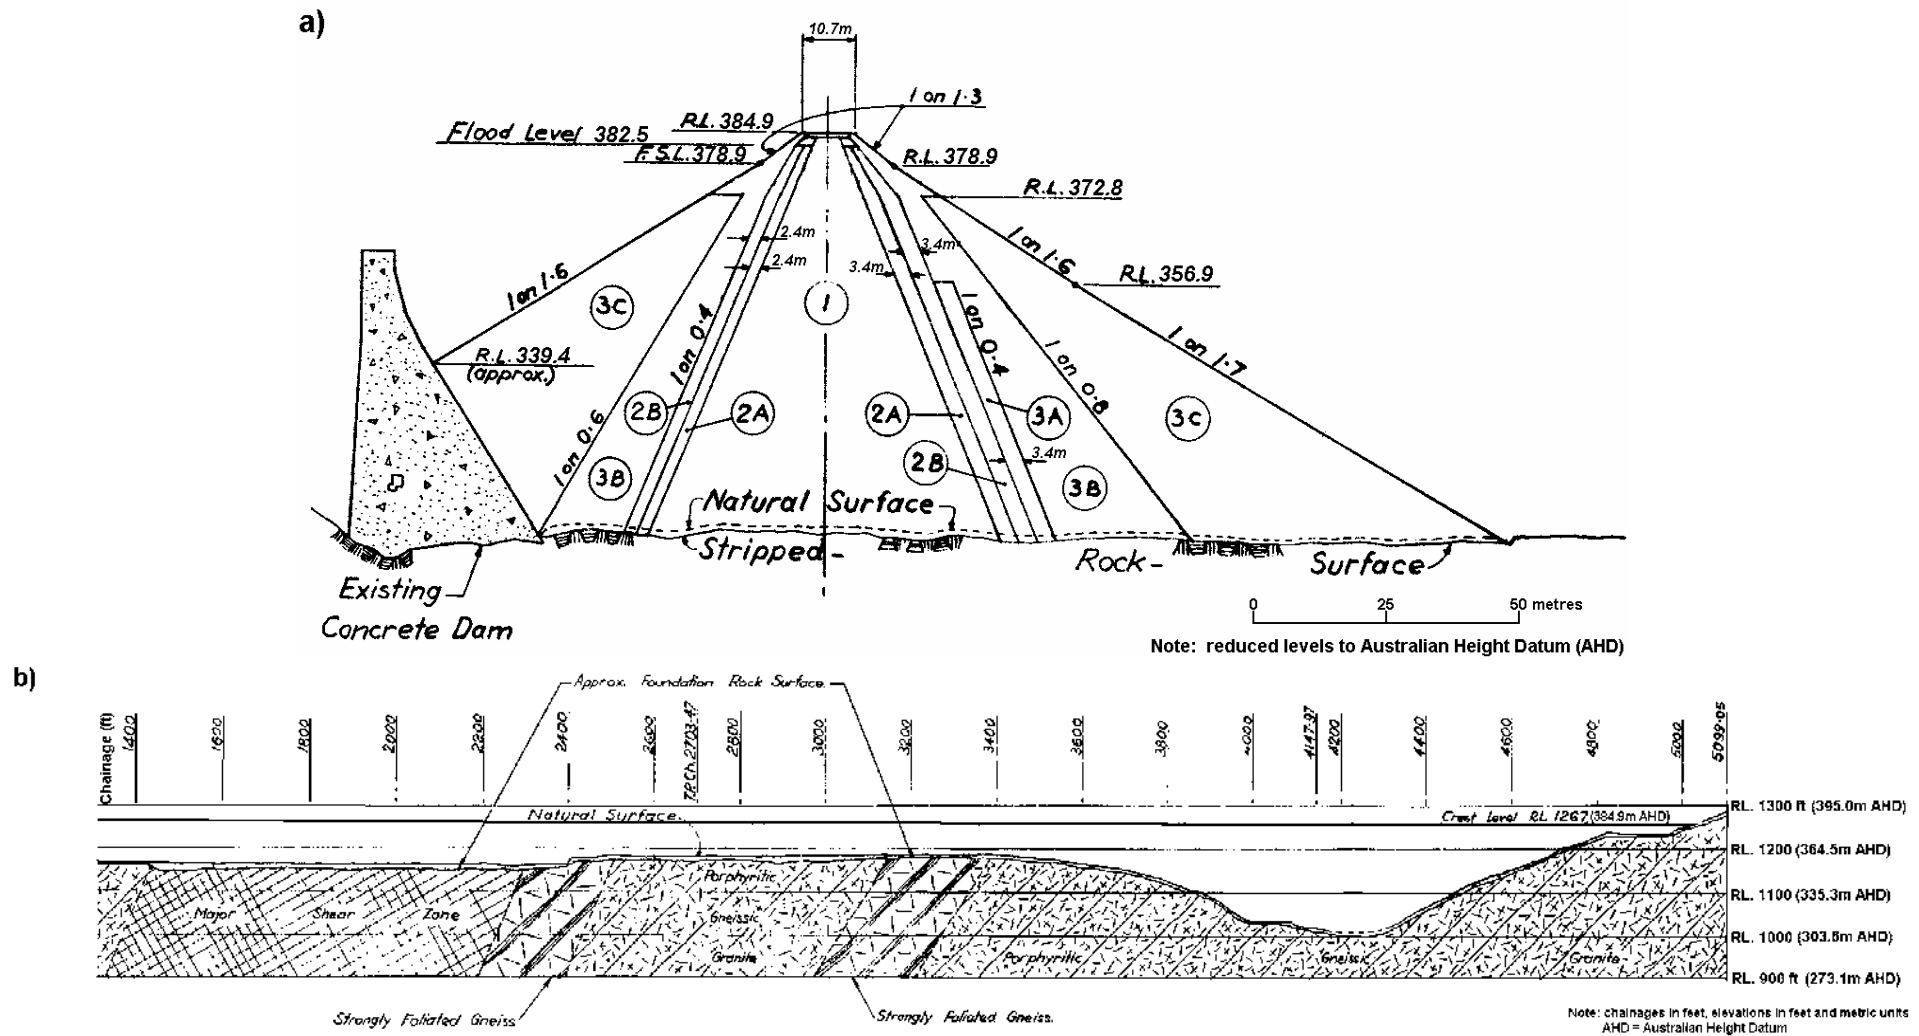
Wyangala dam, (a) main section and (b) longitudinal section (courtesy of New South Wales Department of Land and Water Conservation).
